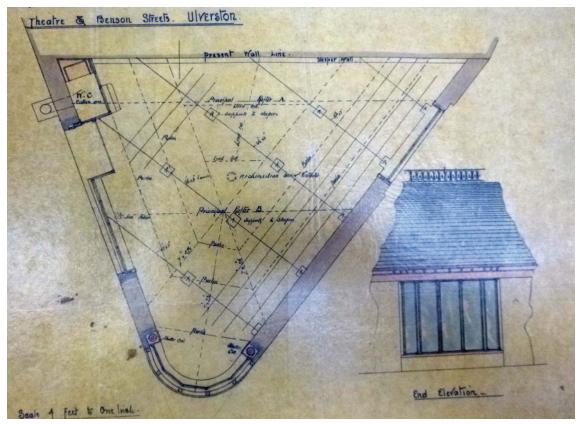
Plan and end elevation of proposed showroom, dated 1873 (north is to the right)
